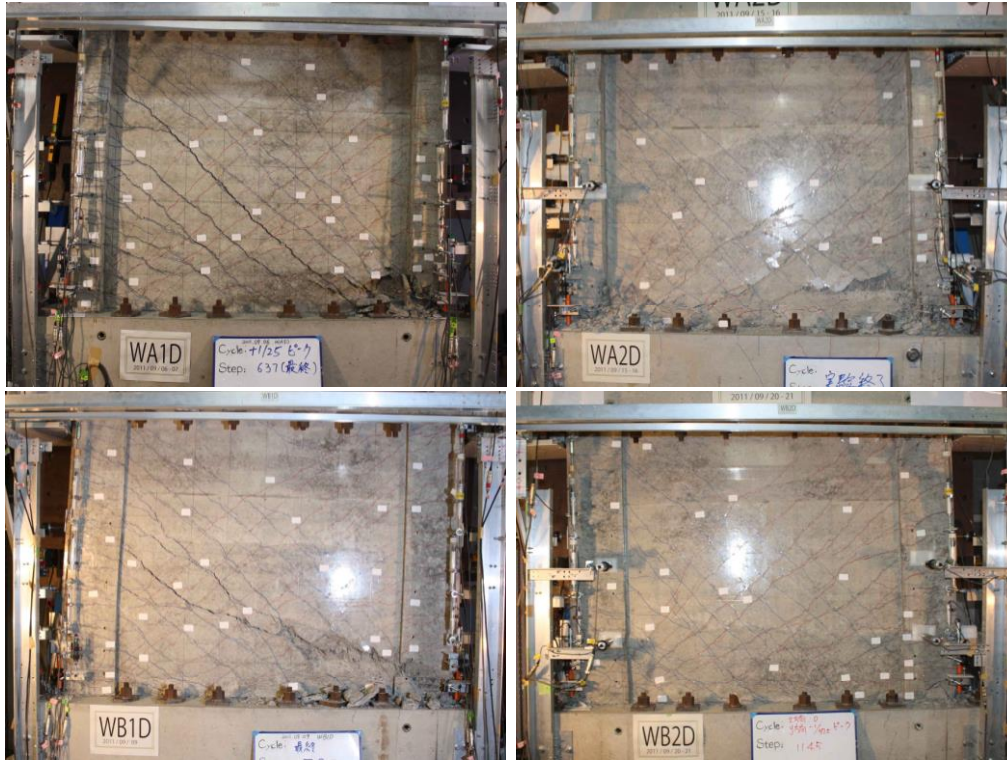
Failure mode of specimens WA and WB under uni- and bi-directional loadings (Kabeyasawa et al. 2014)
